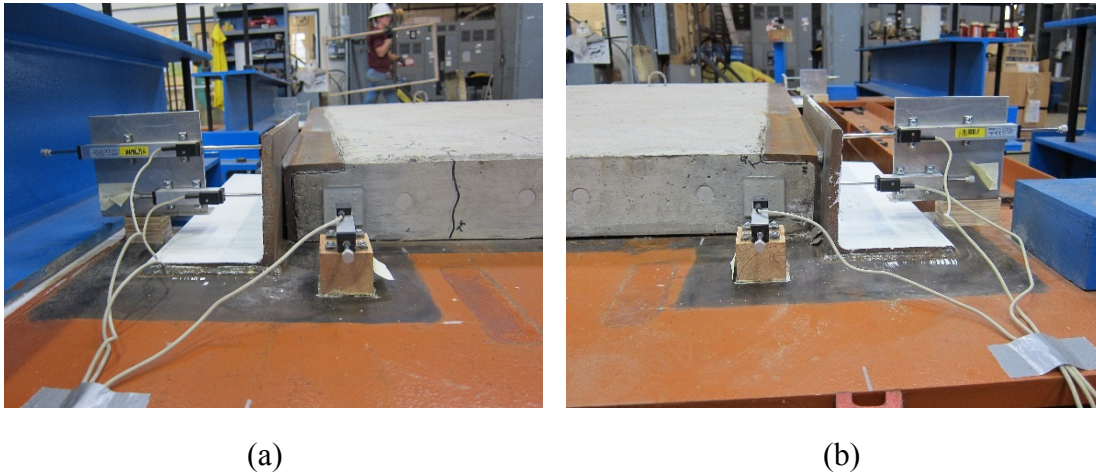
Elevation View at the South-East (a) and the South-West (b) Corners of Test 5 PCP at 1.1" of Panel Movement
